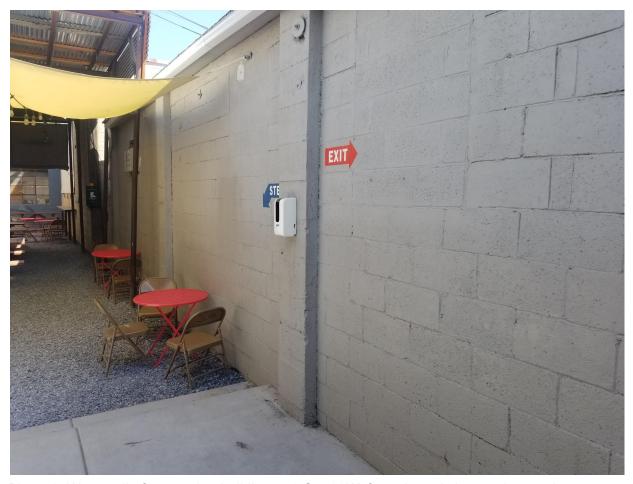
West wall of expansion building 778 S. 300W. from the existing outdoor patio area. This wall will be altered to accommodate overhead doors, man doors and windows to connect the new Tavern space. See the elevation drawings for more details.
